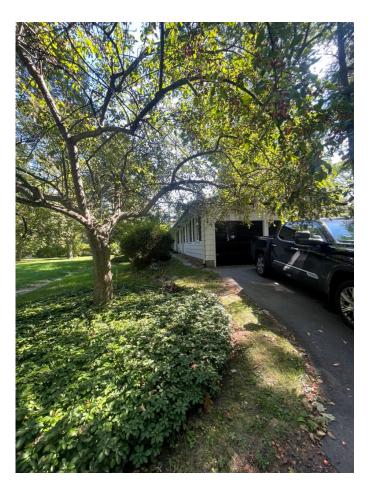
& 5: Garage and Partial Front and Rear Elevations
